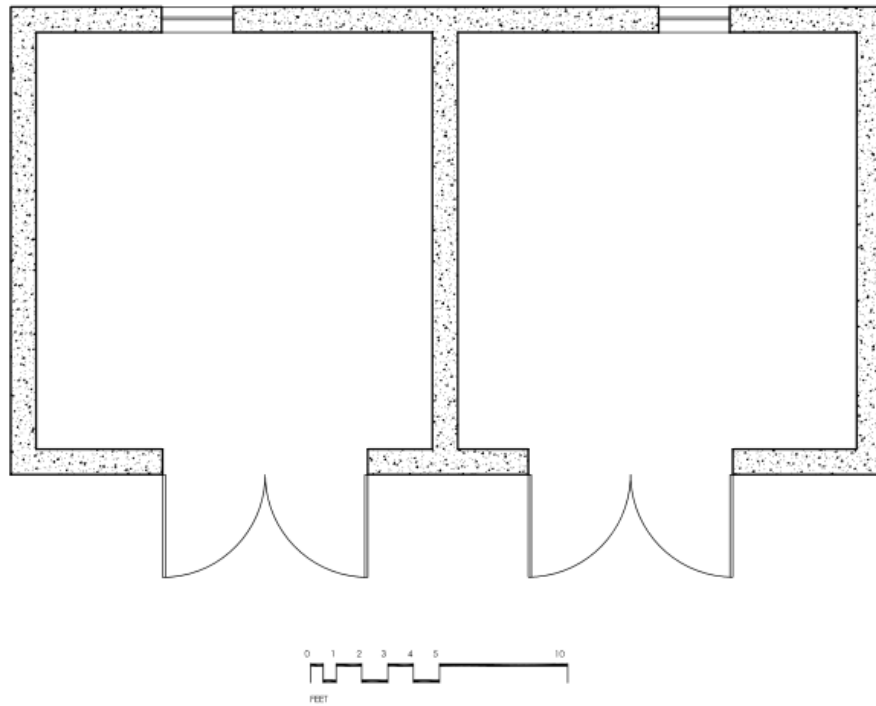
Plan of the gravel wall carriage house adjacent to the McCue House, constructed ca. 1860. Plan measured and drawn by the author, 2017.
